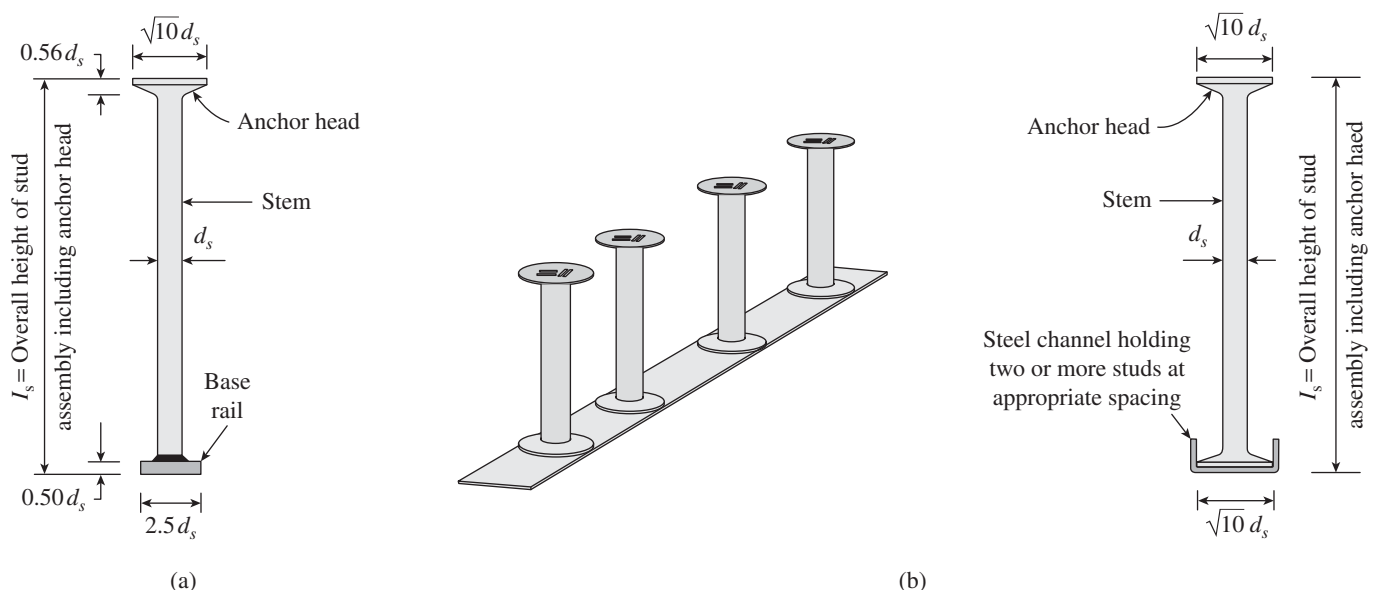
Headed shear stud reinforcement conforming to ASTM A1044/A1044M (a) Single-headed studs welded to base rail (b) Double-headed studs crimped into a steel channel
